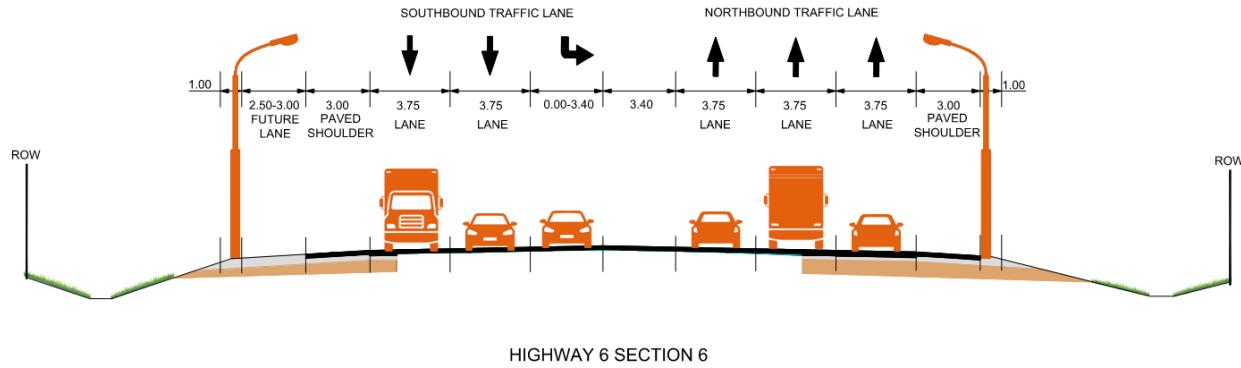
Highway 6 Full Construction – From North of Mountain Brow Road to the South of the Interchange
